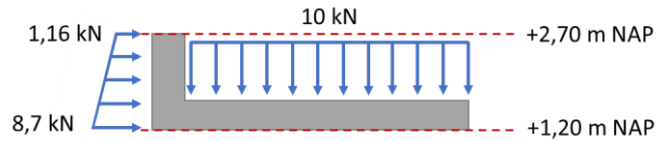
Different loads that acts on the concrete wave breaker and boulevard
